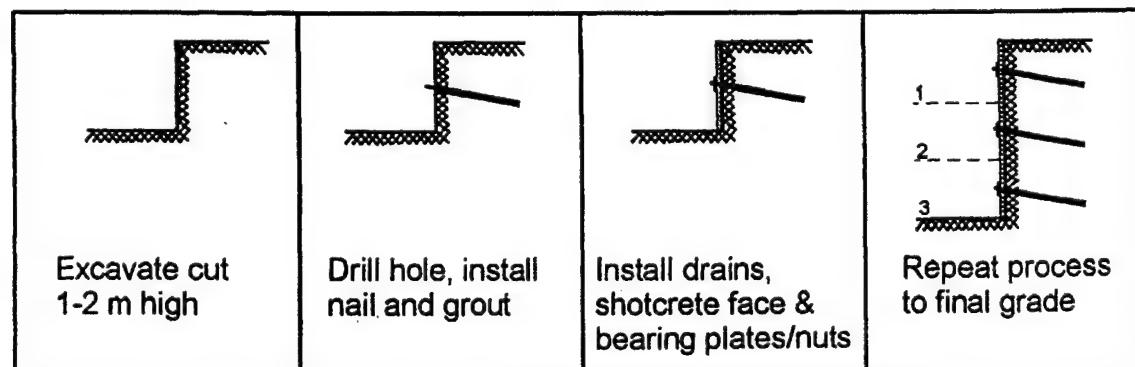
Soil nailing for excavation support (after Walkinshaw and Chassie, 1994).
